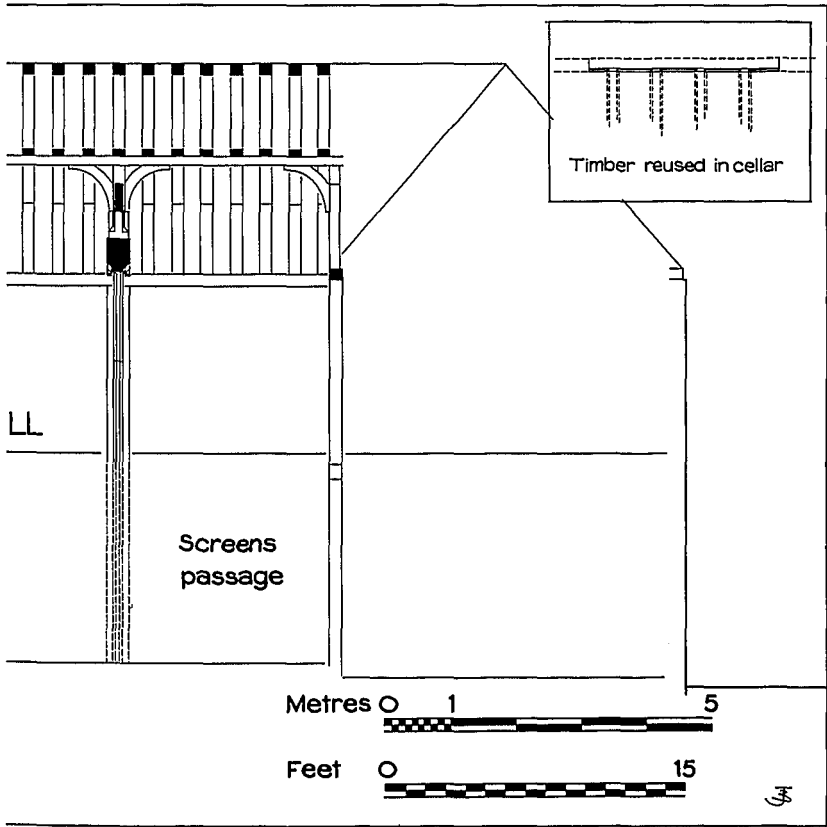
Horton Manor: Longitudinal Section through Hall.
